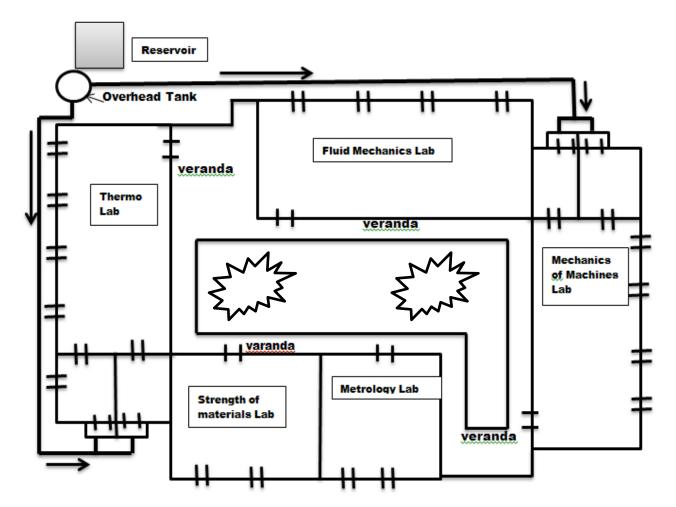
The Plan View of the Mechanical Engineering Laboratory Complex and Pipeline Layout. The Arrow shows the Direction of Water Flow from the Overhead Tank. Project Detail
